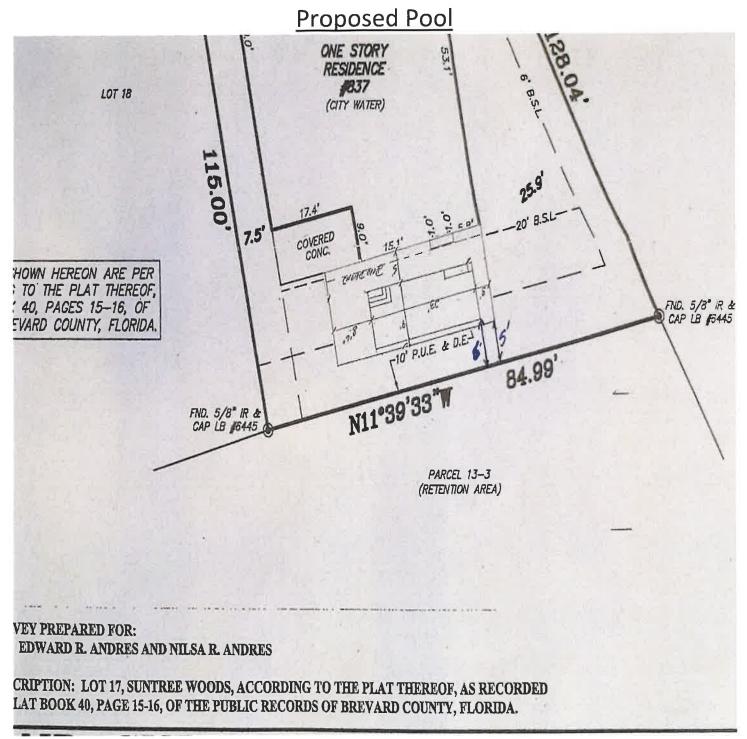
Proposed pool sketch. The sketch shows the proposed pool to be constructed on Lot 17, Suntree Woods, 837 Suntree Woods Drive, Melbourne, Florida, 32940.
